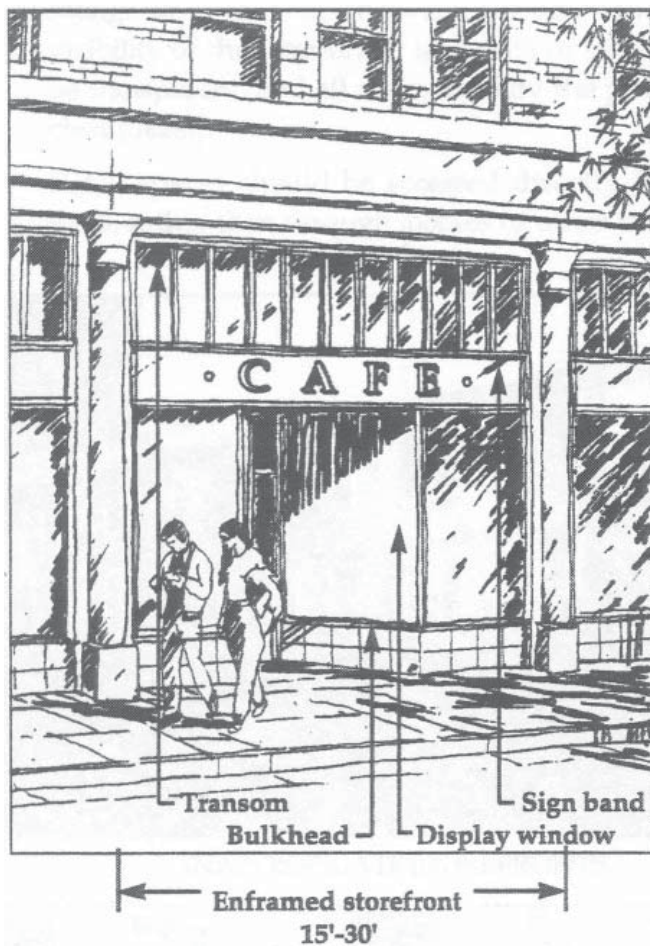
This storefront, typical of Landmark and Significant buildings, features several traditional storefront components: large display windows, a sign band, transom windows and a recessed entry. It is enframed and defined by the architectural elements of the façade, and continues the rhythm of storefront bays along the sidewalk.
